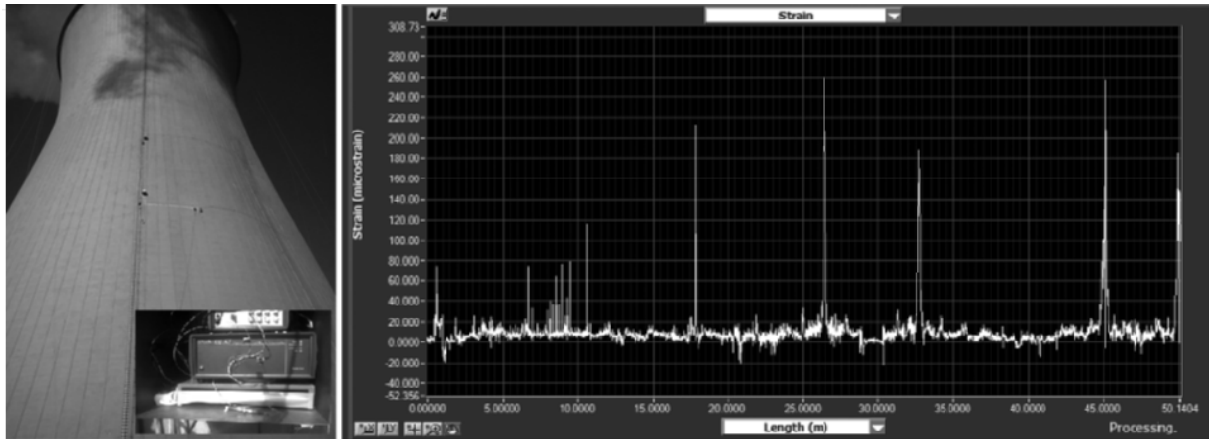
Instrumented concrete cooling tower (left); Strain-fiber length on the inside surface of the tower (right) [91]
